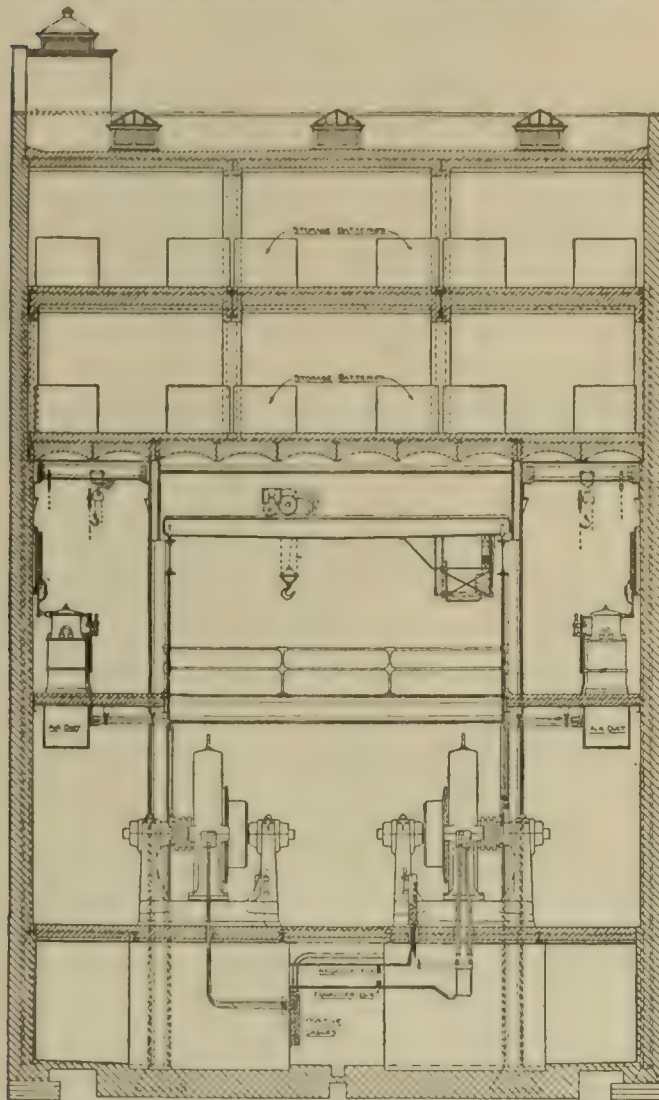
CROSS SECTION OF SUBSTATION, MANHATTAN RAILWAY.
